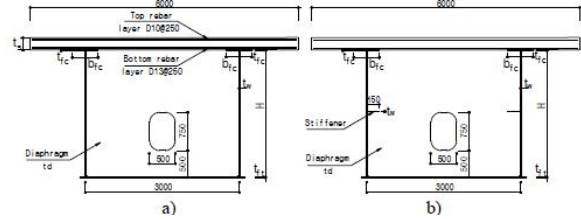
The cross – section of the OSSCCB girder: (a) WoLS; and (b) WLS
